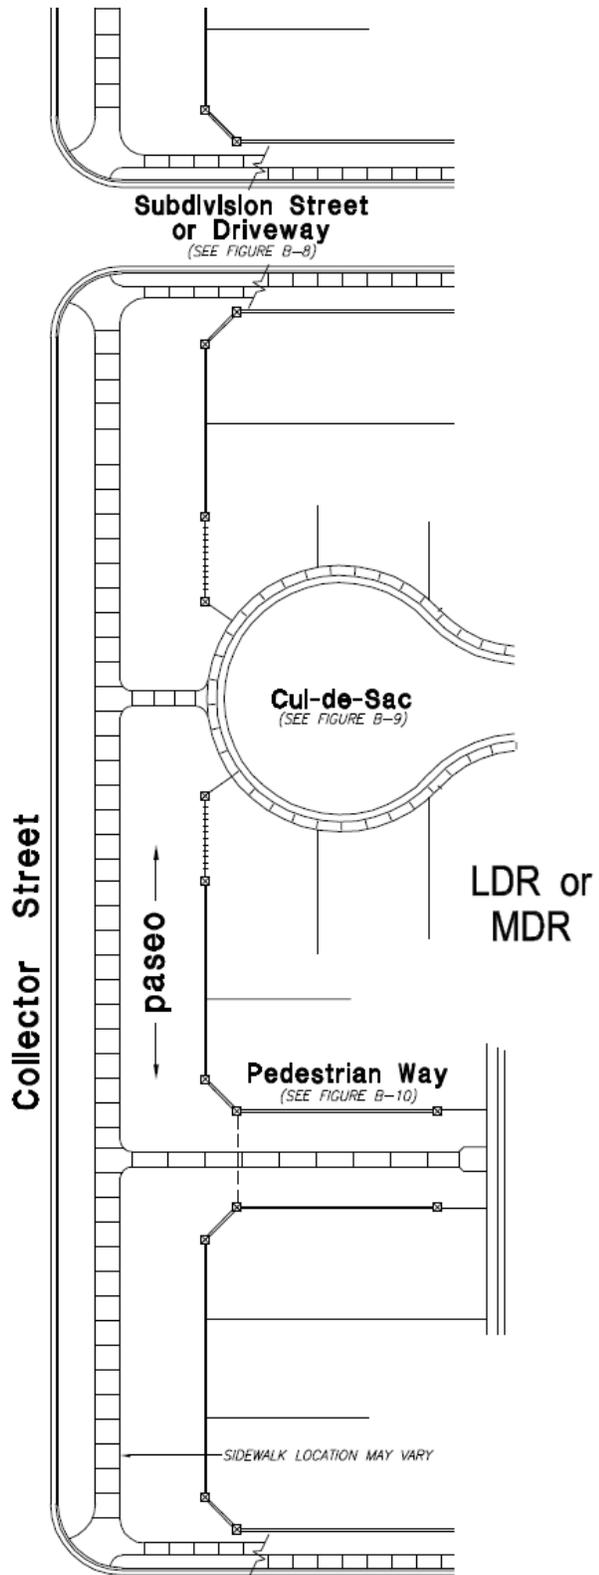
Collector Street Paseo Pedestrian Connection Points
